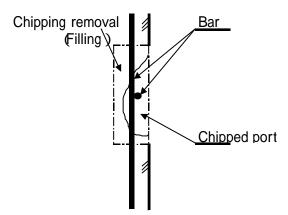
Filling method for this bridge (New Nyali Bridge pier)
